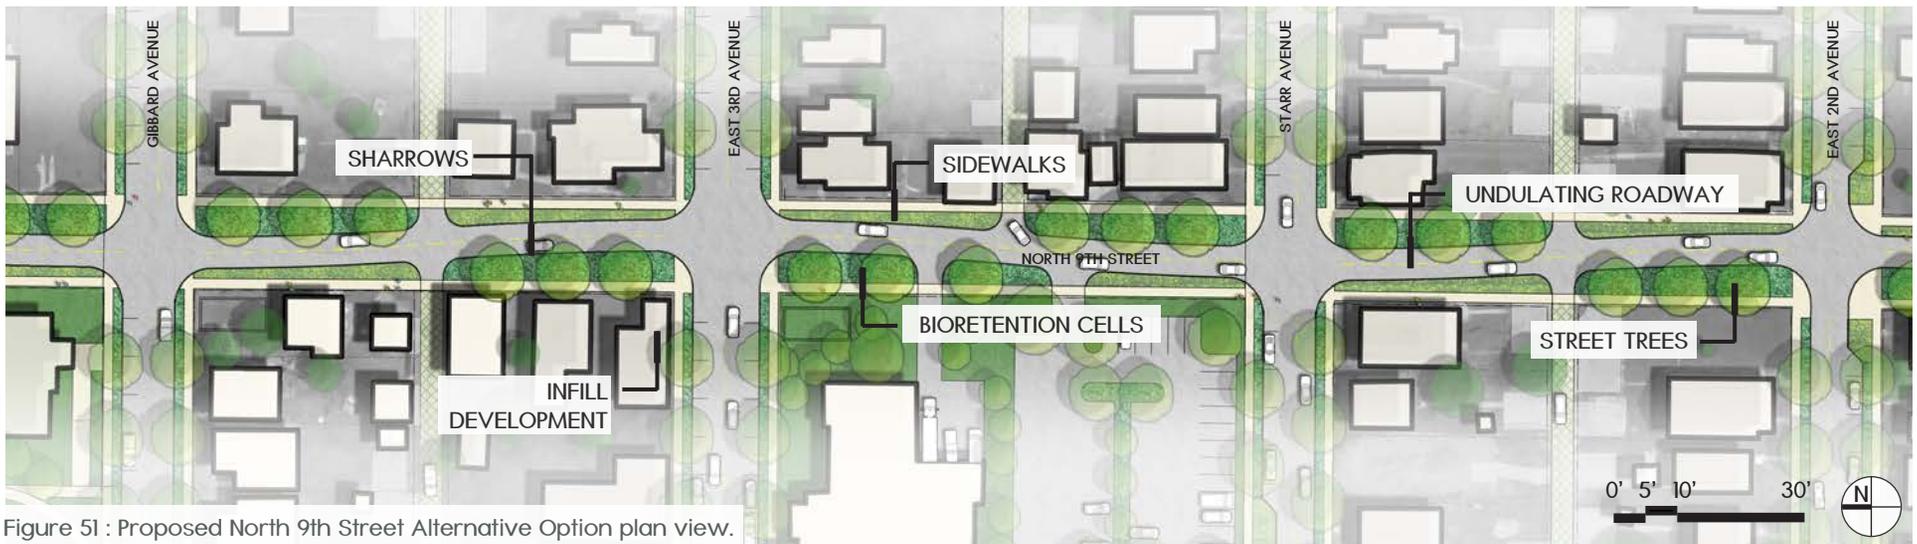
Proposed North 9th Street Alternative Option plan view.
